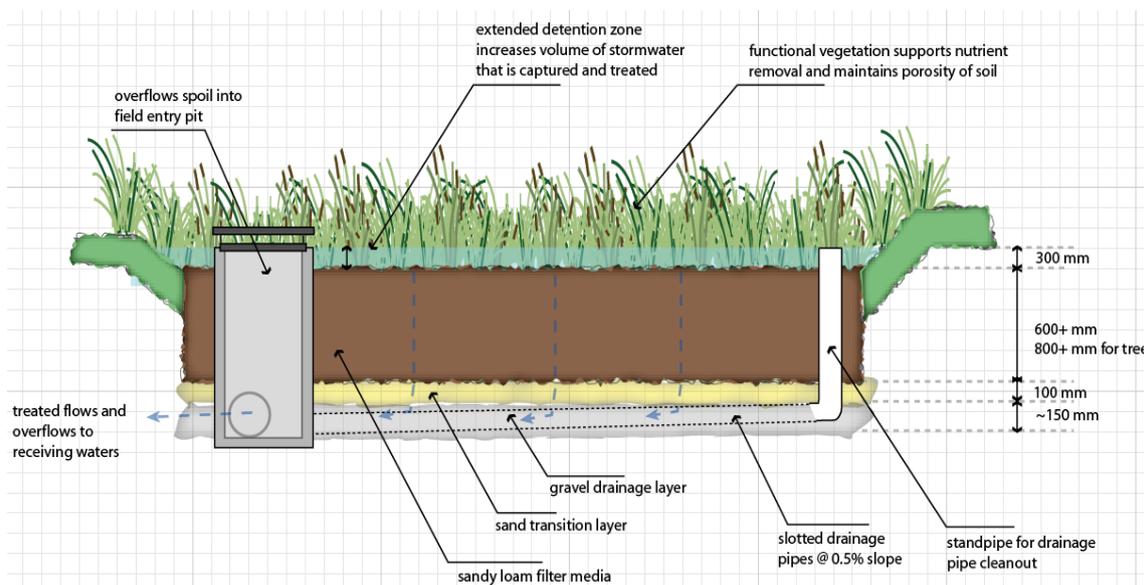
Bioretention system typical arrangement (Water by Design 2009)
